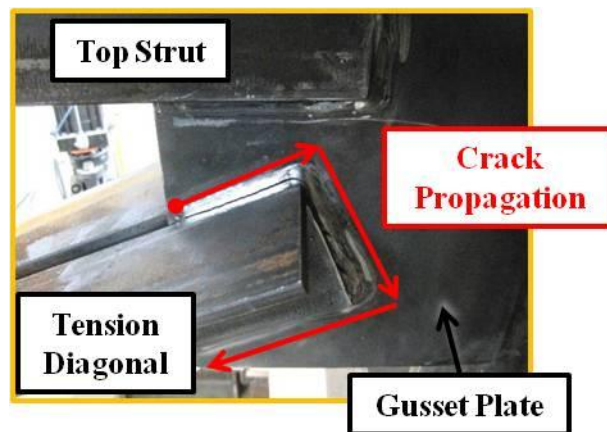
Typical Z Frame Double Angle Fatigue Failure Mode (ZF_DA_3)
